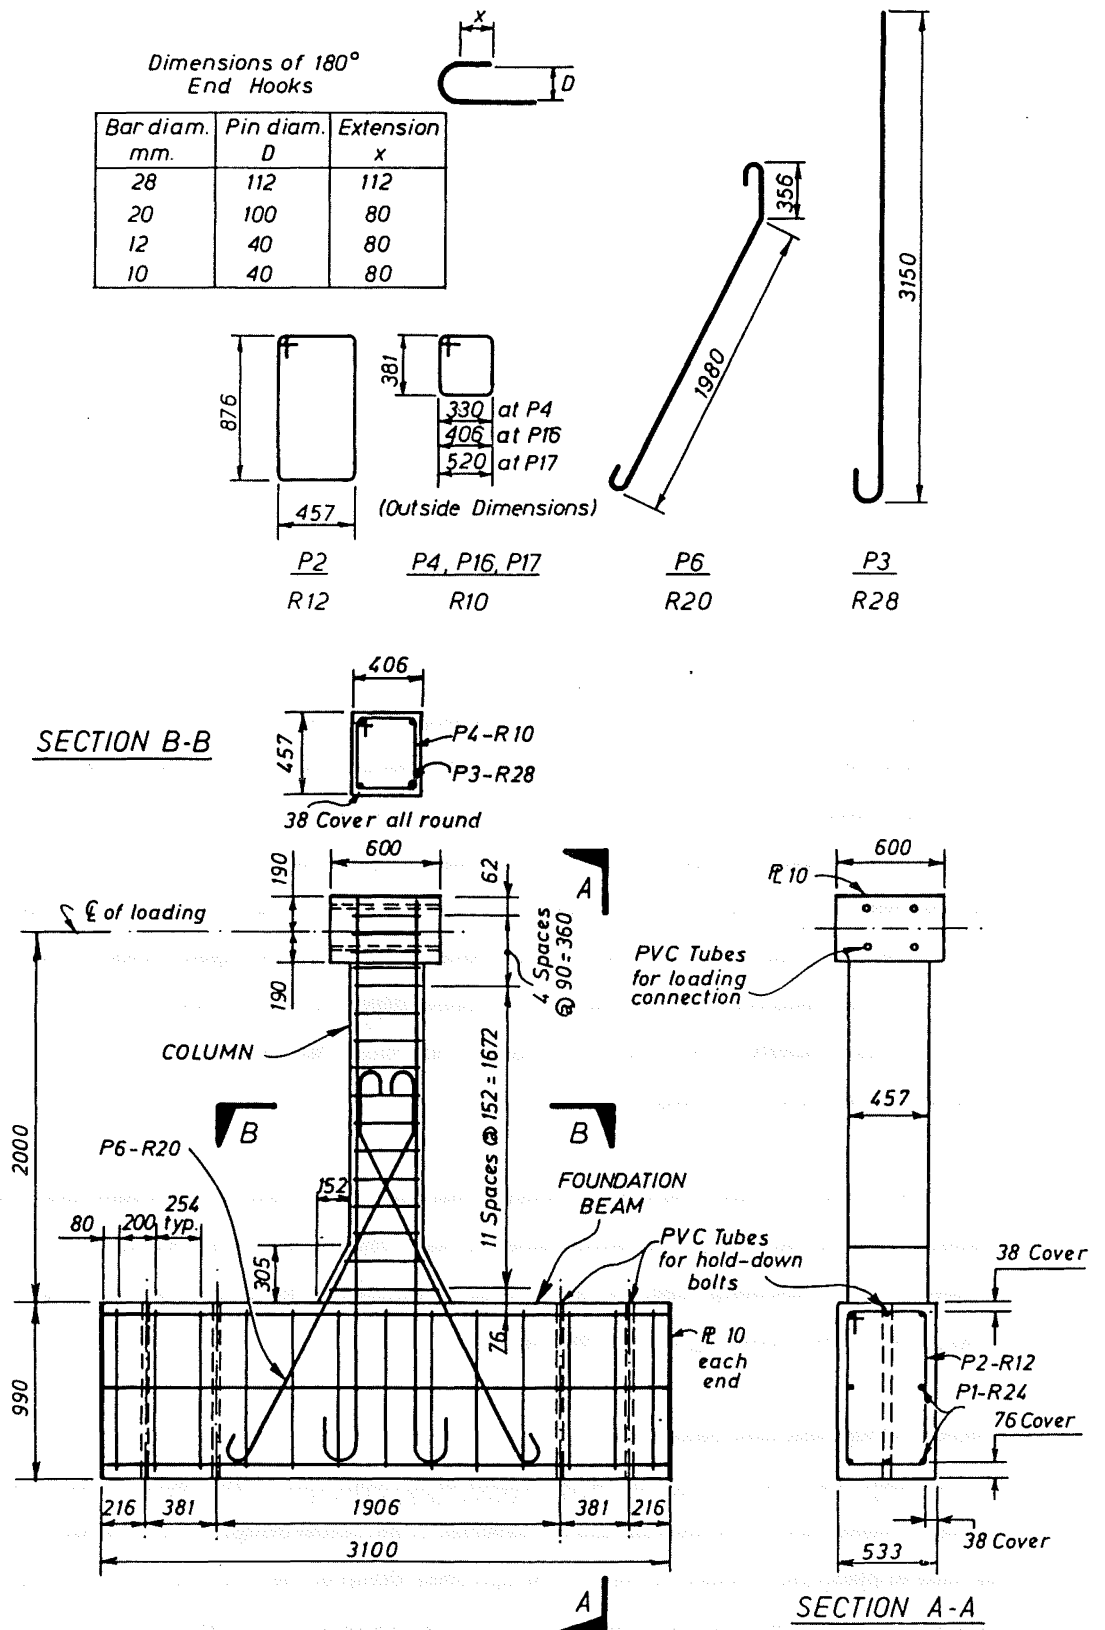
Column to foundation-beam test specimen and reinforcing details.
